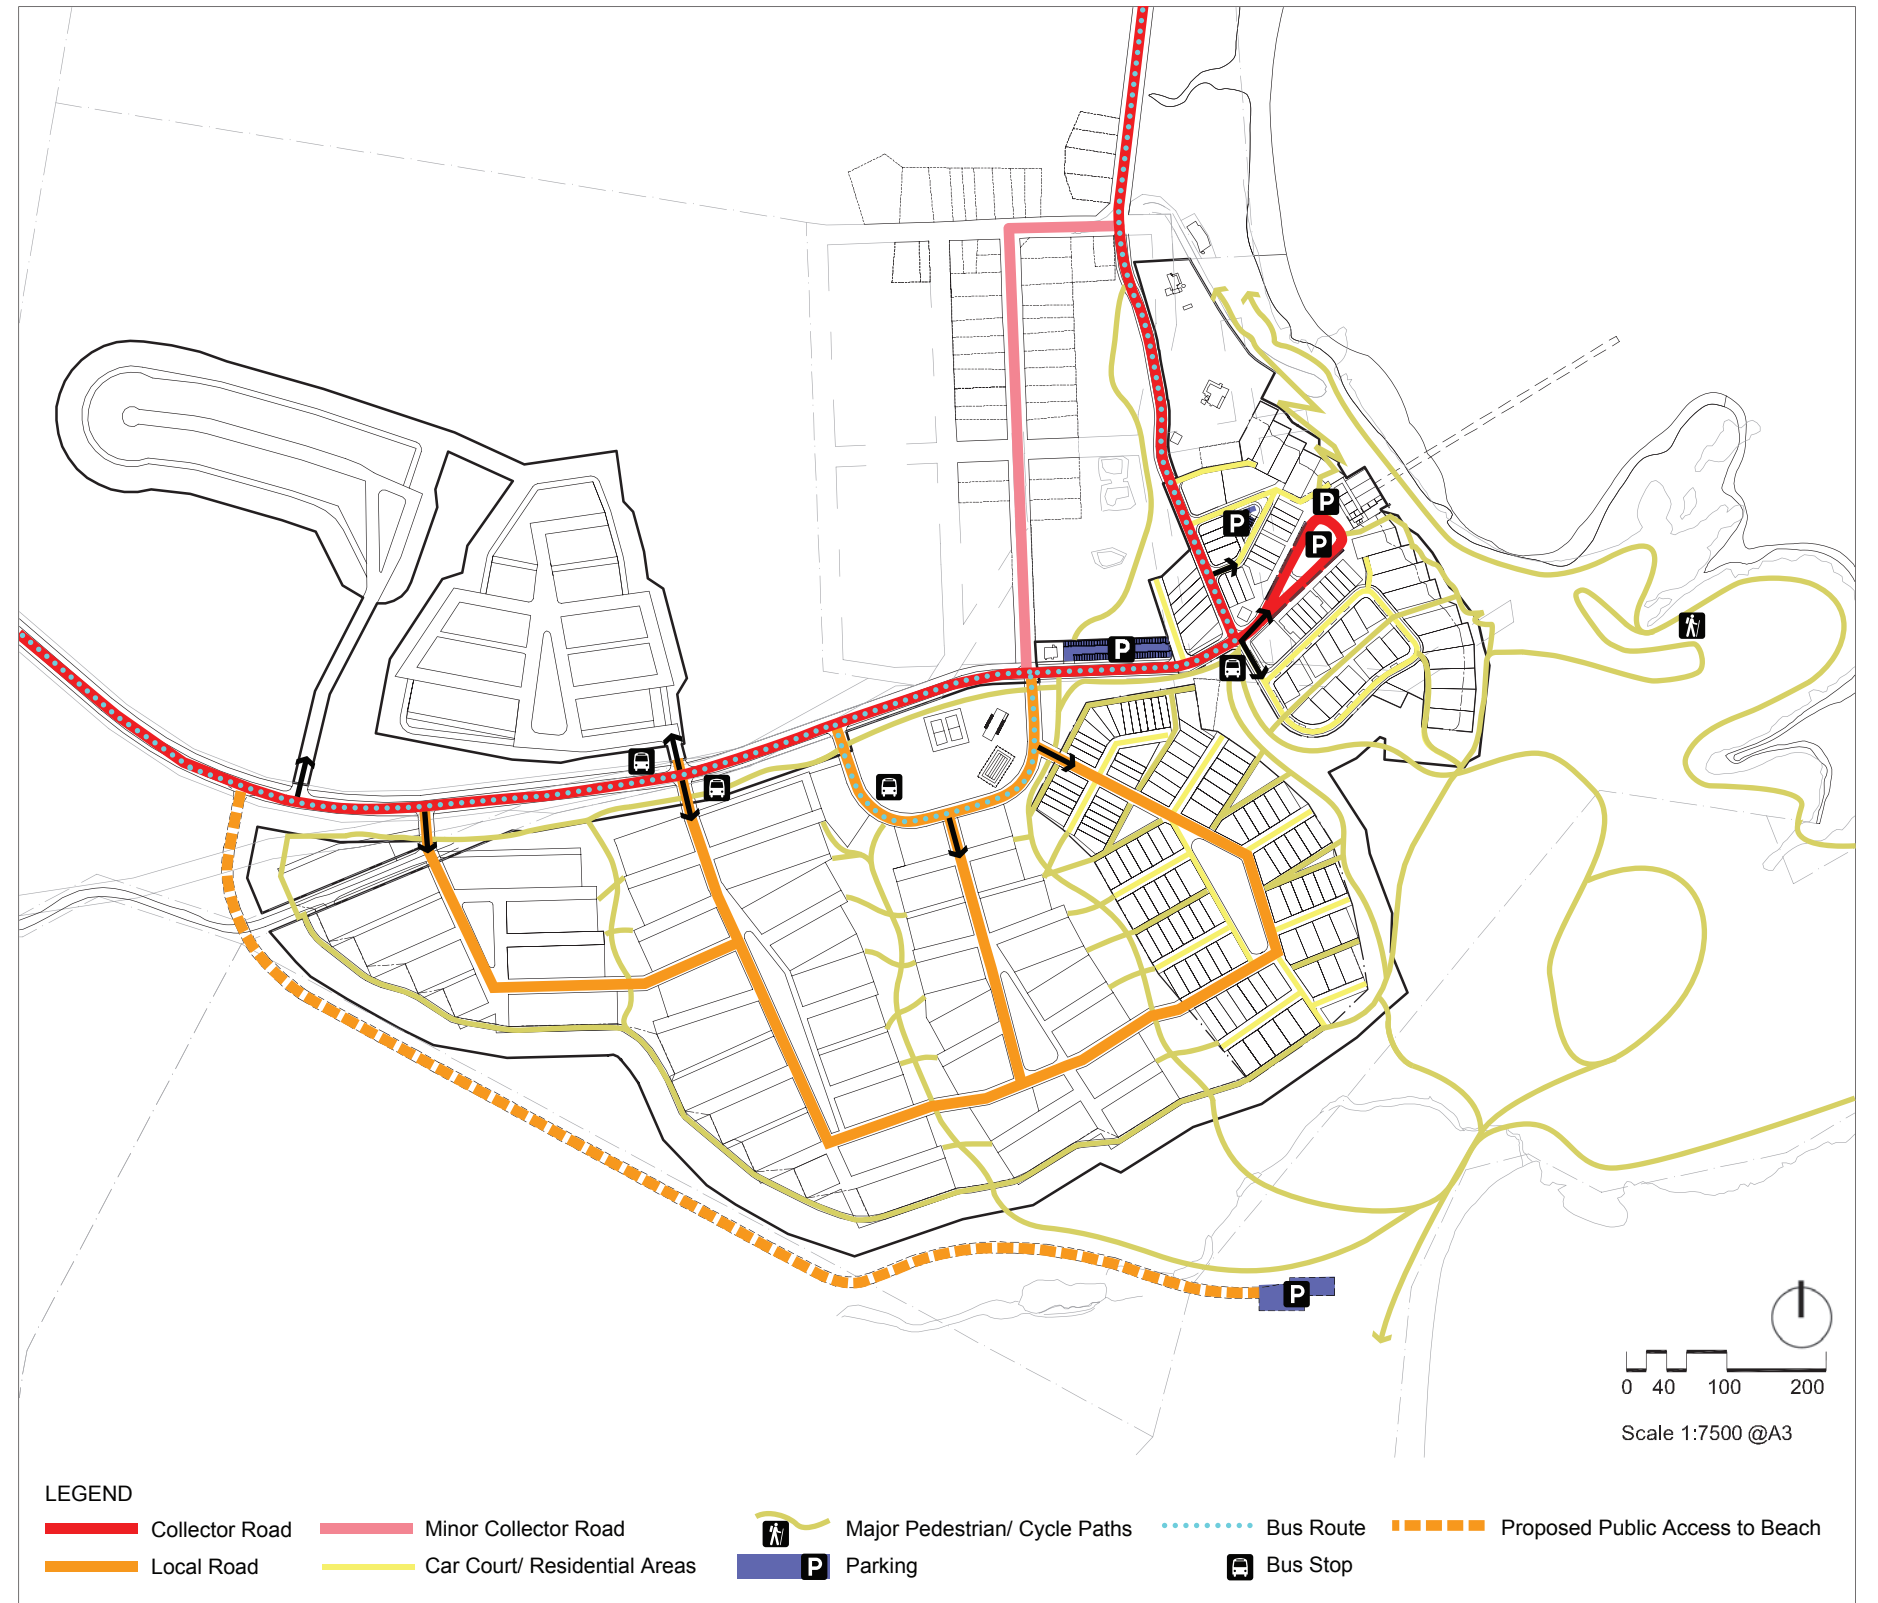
The Moonee Hamlets Access, Parking and Circulation Plan.
